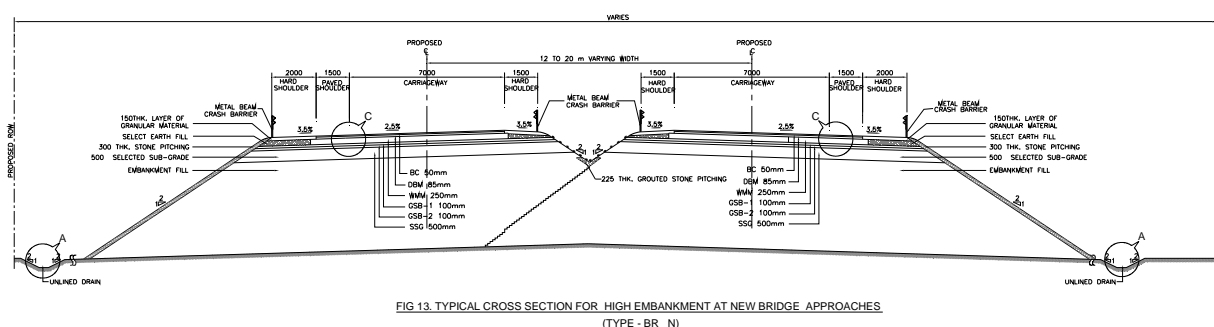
Typical Cross-Section for High Embankment at New Bridge Approaches (Type BR_N)
